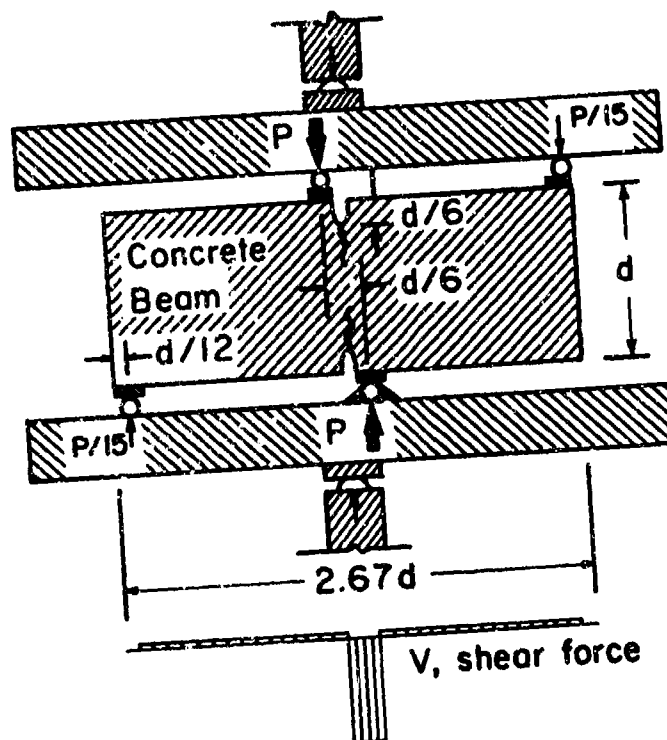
Mode II Fracture Specimen and Loading Apparatus.
